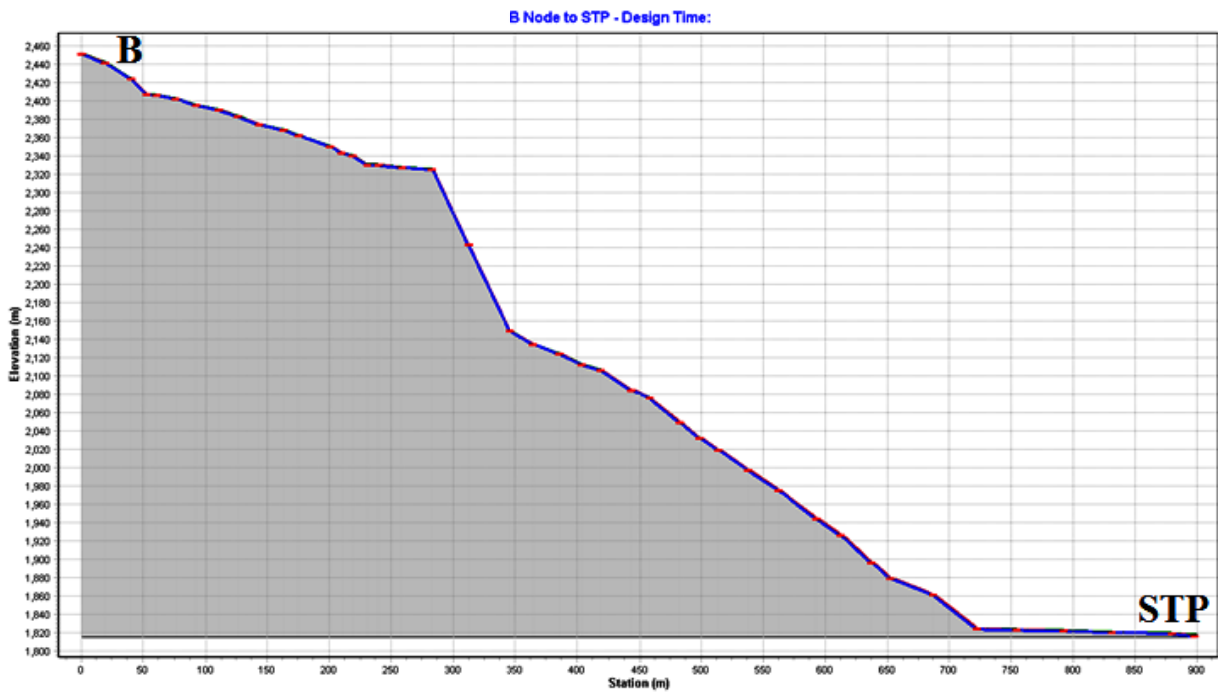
Graph Showing Elevation of Manhole, Conduits and Out Fall from Point B to STP
